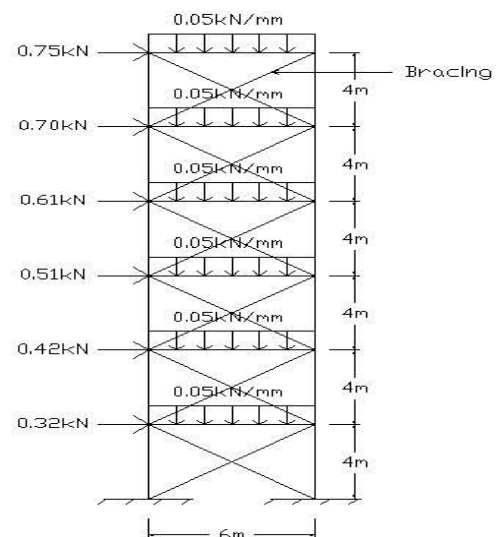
Analytical model for Case 3 : Steel frame structure with fully braced
